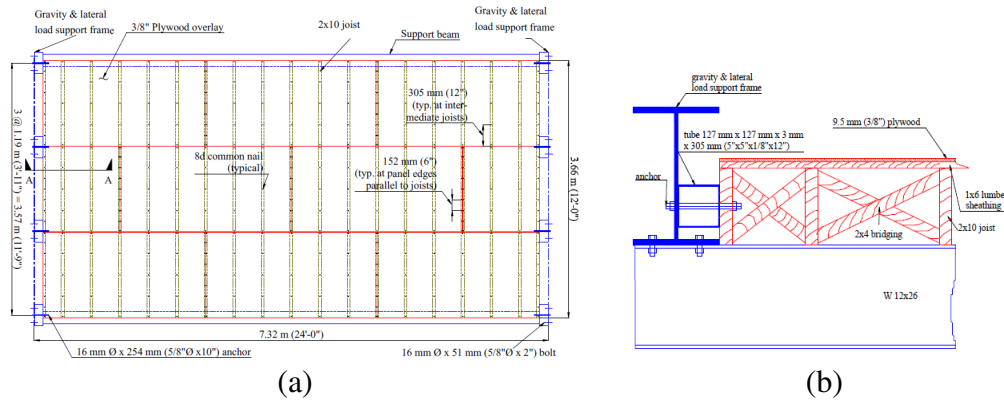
MAE-2B test specimen: a) plan view details; b) connection details
